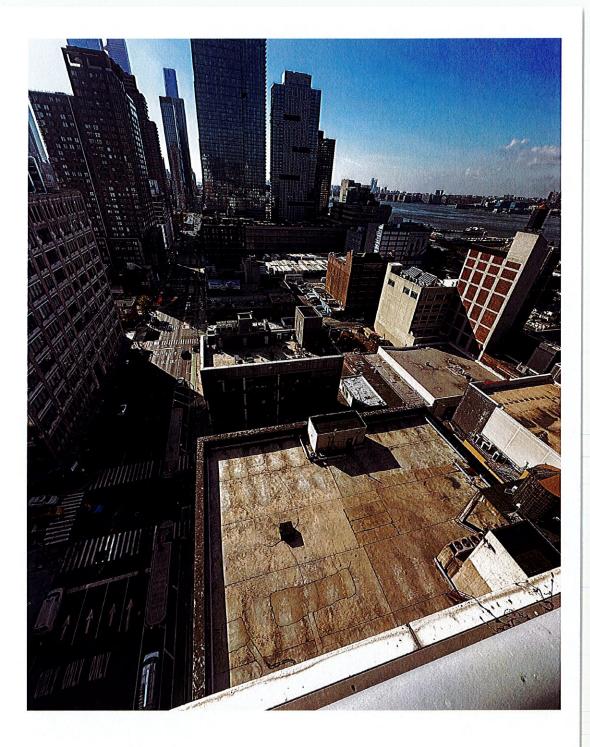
# PHOTOS OF SURROUNDING BUILDINGS IN VIEW OF OUTDOOR SPACE
